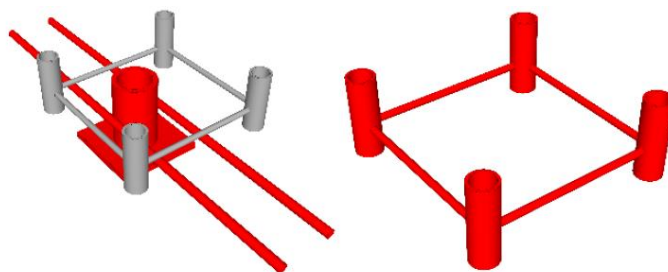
Hybrid anchoring element: Left for handling with bridge superstructure (highlighted in red), right for anchoring of railing
